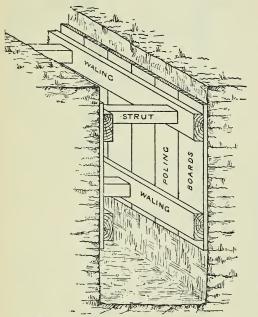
Waling, Poling Boards, etc., in Close Timbering.
